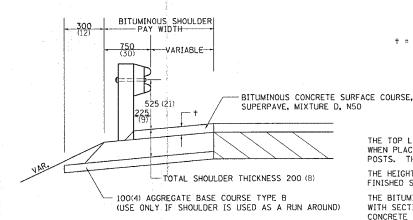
## DETAIL OF BITUMINOUS SHOULDER AT GUARD RAIL
